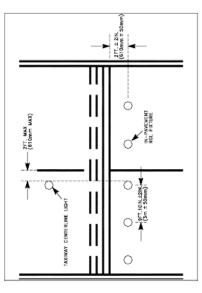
In-Pavement Runway Guard Lights (From AC 150/5340-30)
